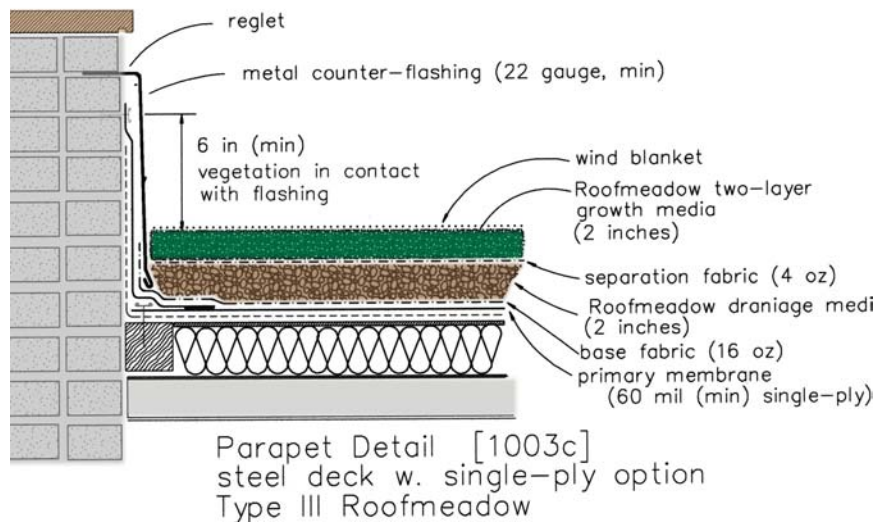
Parapet detail courtesy of Roofscapes, Inc.
